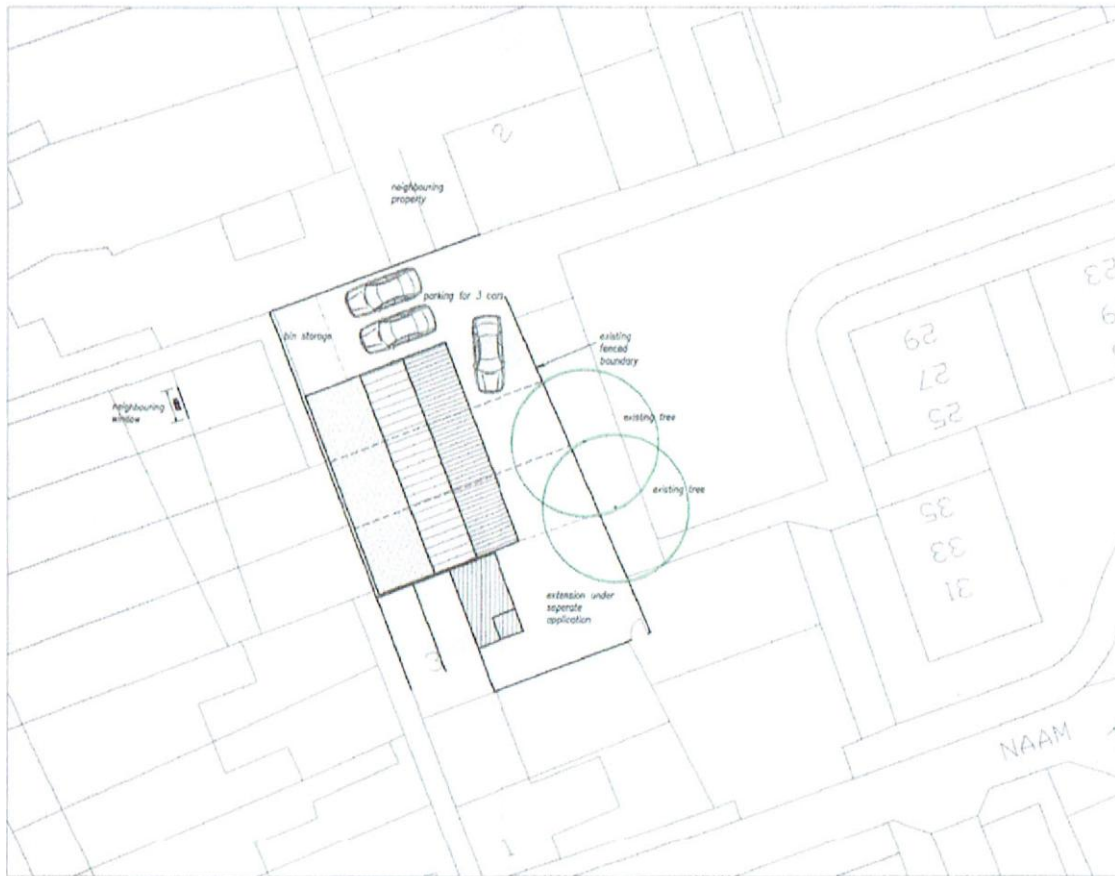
Block plan showing the site location and proposed layout of the development site at an original scale of 1:200, (not to scale), (extract from Architects plan).
